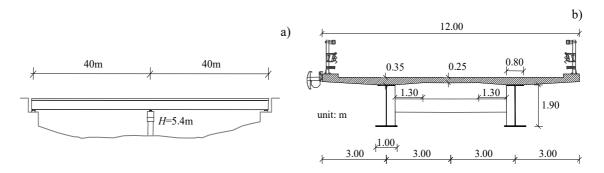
a) Two-span bridge profile, b) transverse deck section (source Tubaldi et al. (2013)).
